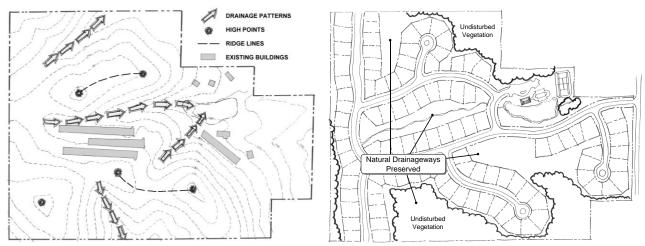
Example of a Subdivision Using Natural Drainageways for Stormwater Conveyance and Management
